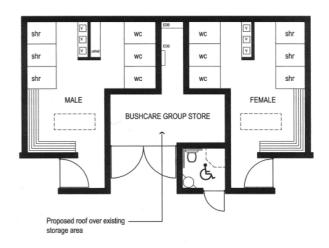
Floorplans of the existing kiosk and amenities buildings
